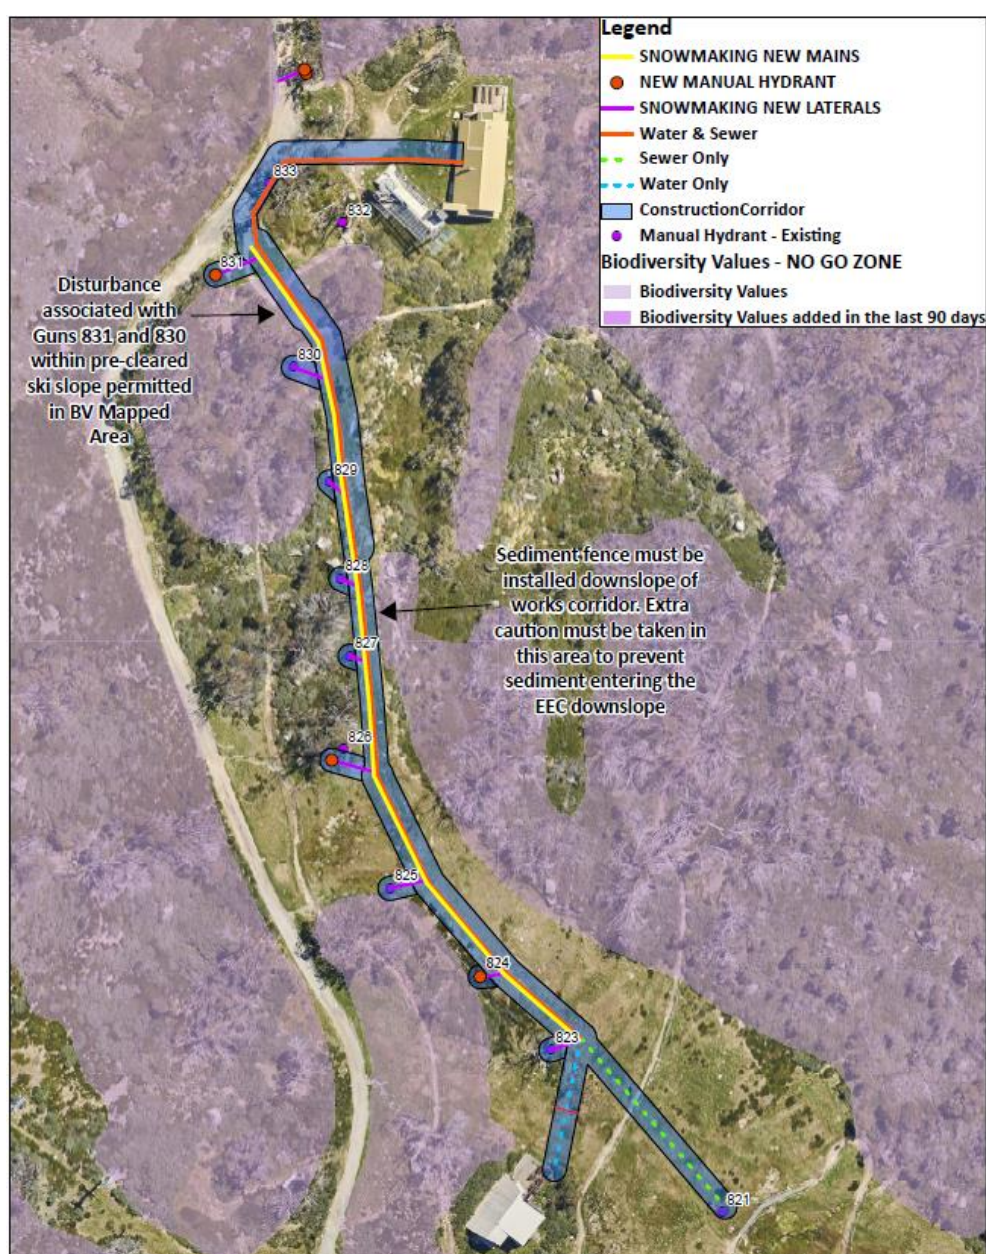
| Village trail area showing proposed construction corridors (Source: Applicant's Documentation)
